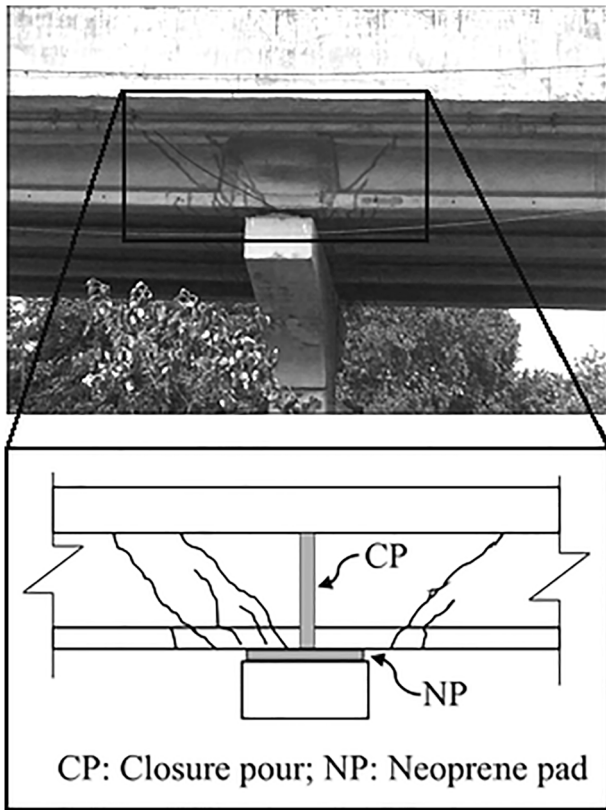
Shear cracks in a highway bridge girder.
